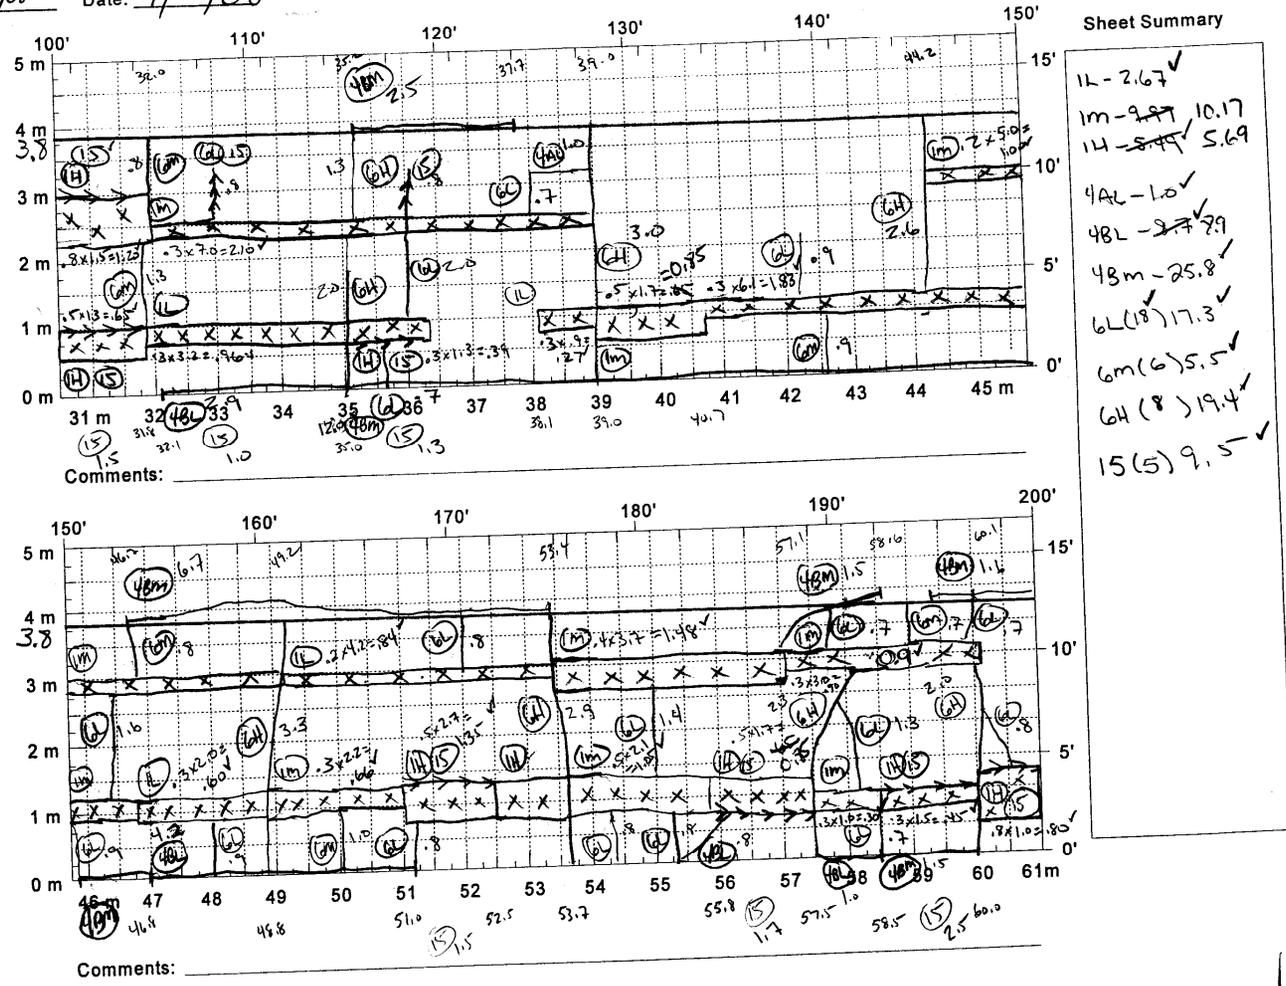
Pavement Distress Map; Station 1+00 to 2+00; Section 0509.
